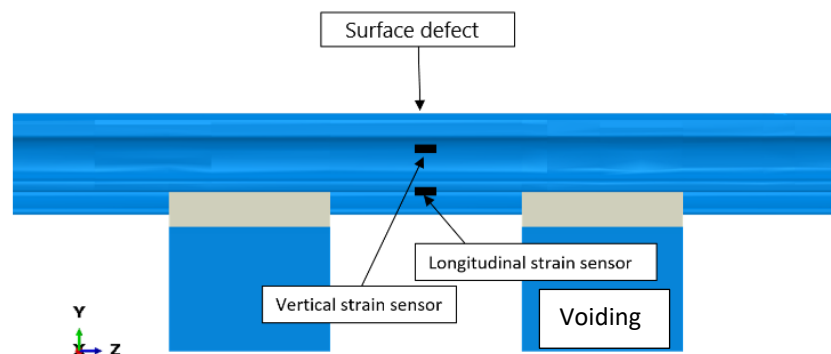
Occurrence of the rail defect between sleeper spacing and sensor installed on the rail in sleeper spacing.
